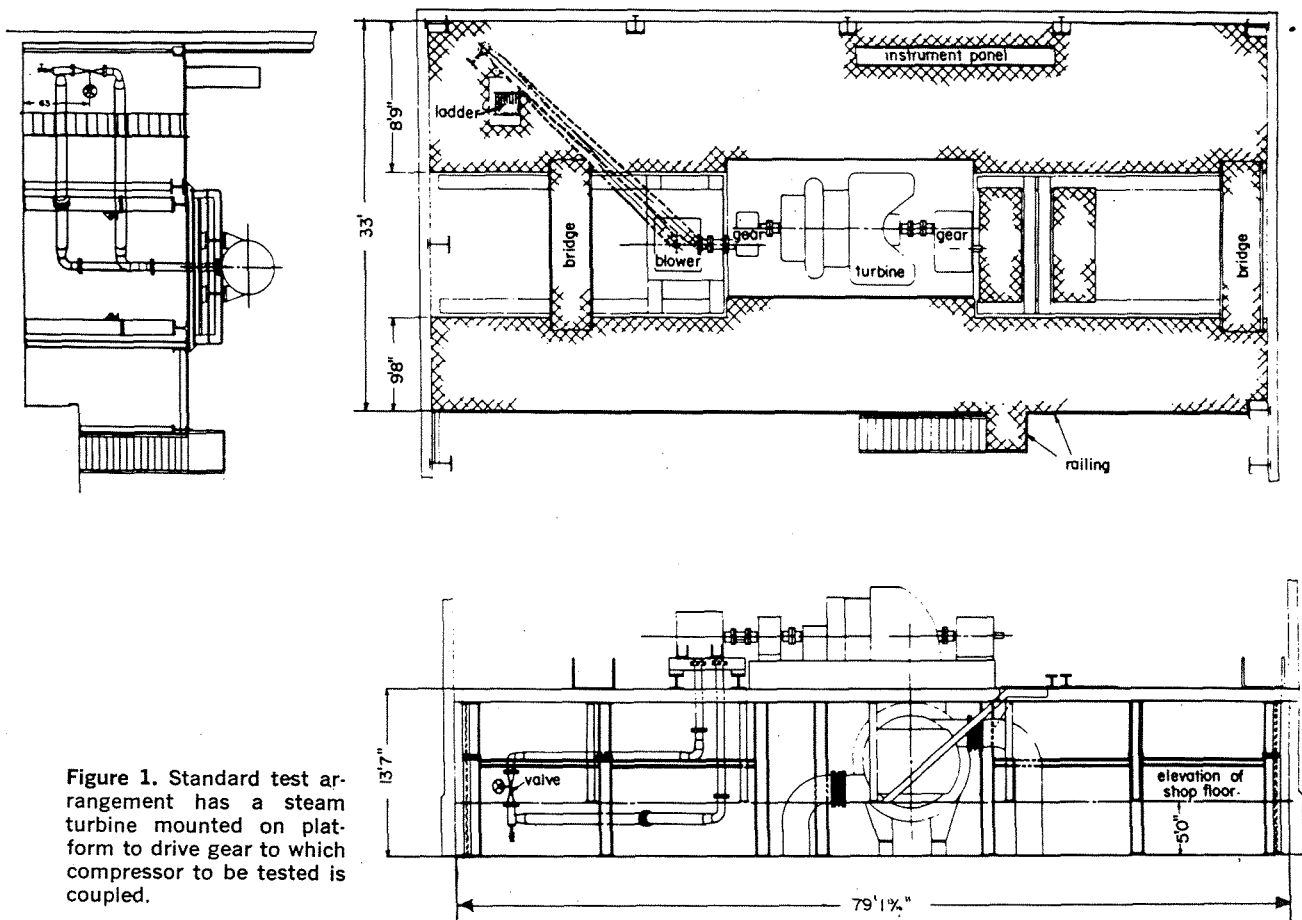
Standard test arrangement has a steam turbine mounted on platform to drive gear to which compressor to be tested is coupled.
